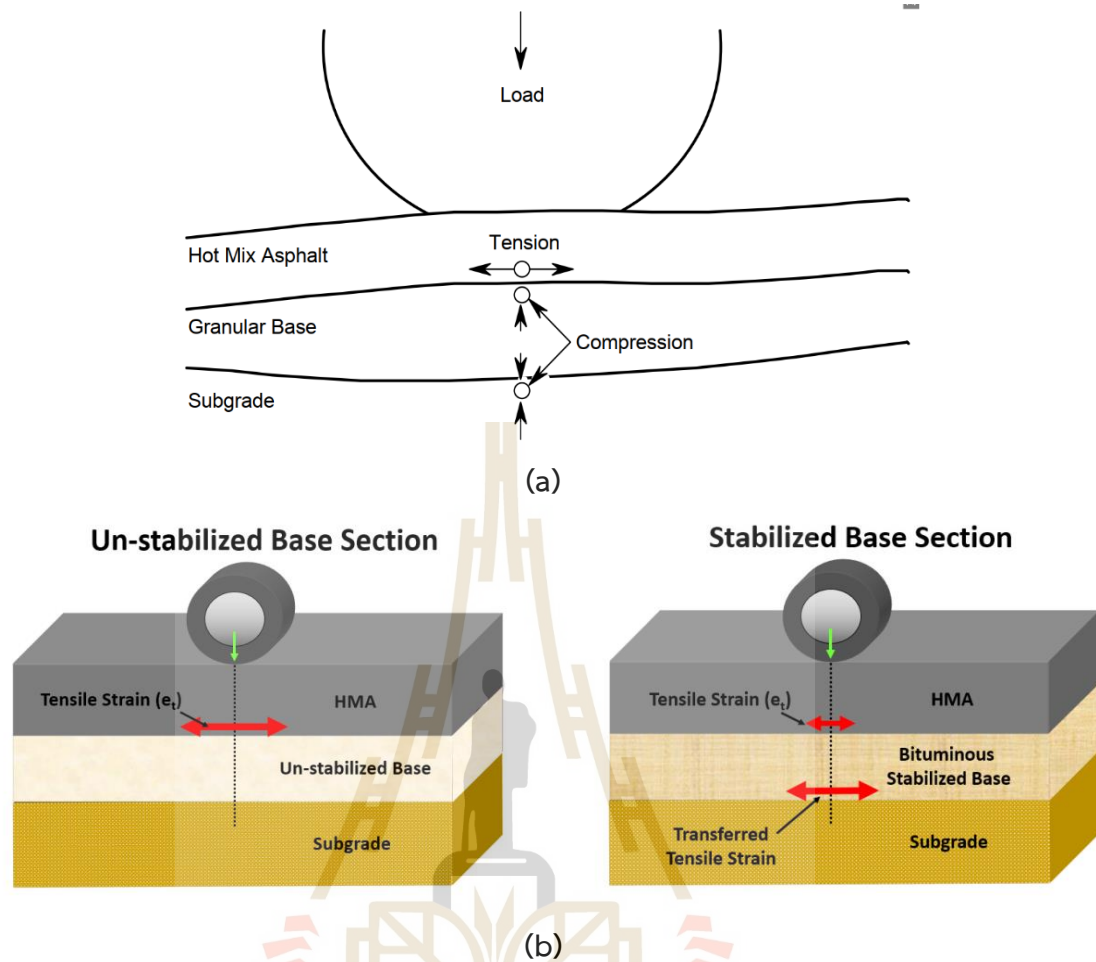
Tensile and compression strains in flexible pavement (a), horizontal tensile strain in un-stabilized and stabilized pavement sections (b) (Wegman et al., 2017).
